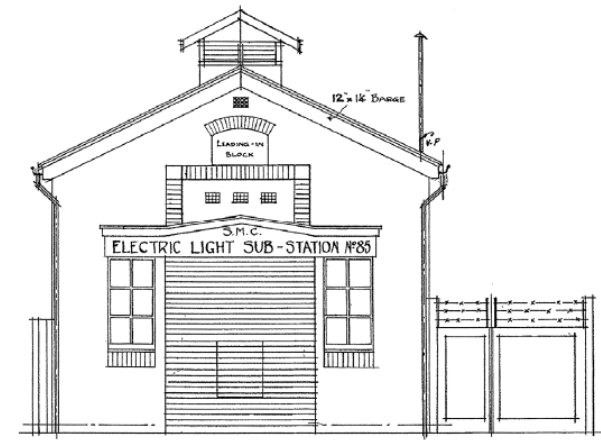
1928 Drawing of the building (Source: Pennington p274)
